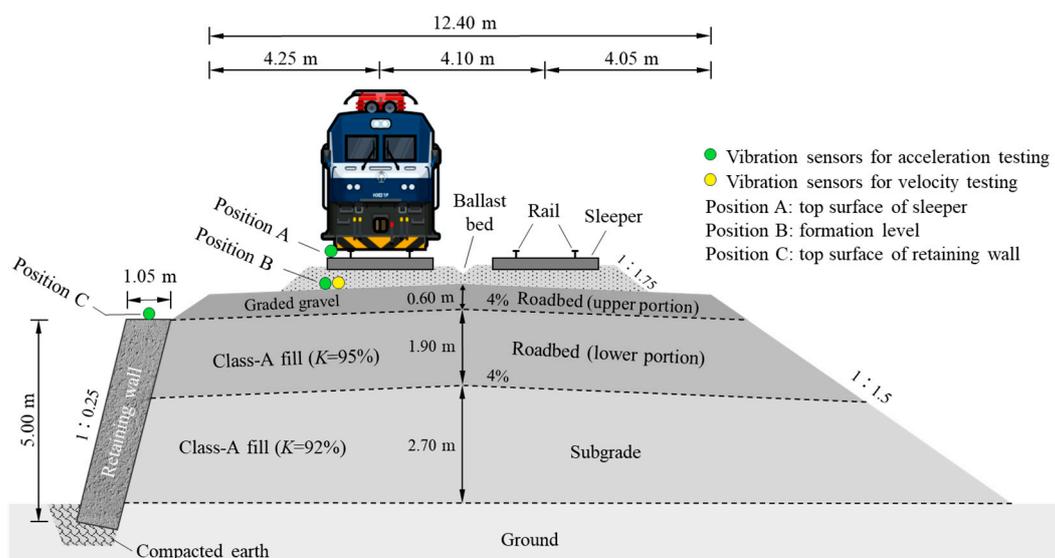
Cross-sectional view of the railway track, underlain by an embankment supported by a gravity retaining wall: K is the percentage of compaction for the embankment fill; two vibration sensors are placed on the roadbed surface.
